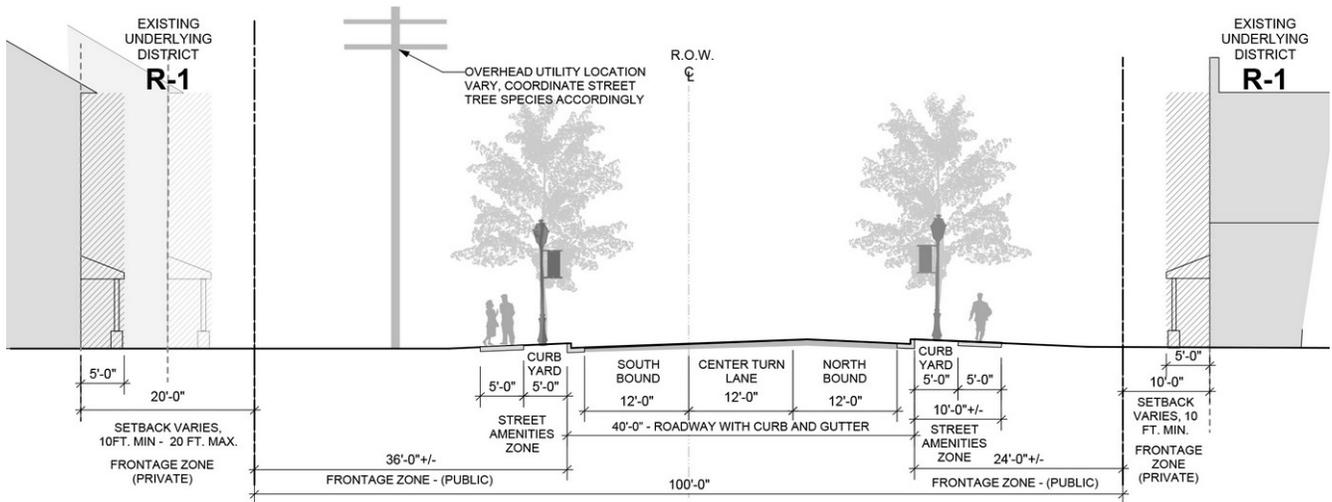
COD-T: Typical Cross Section – To Show Relationship Between Future Streetscape And Academy Park
